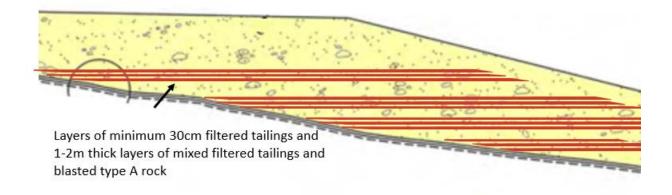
Expanded View of Cross Section Through the Class A Storage Facility
